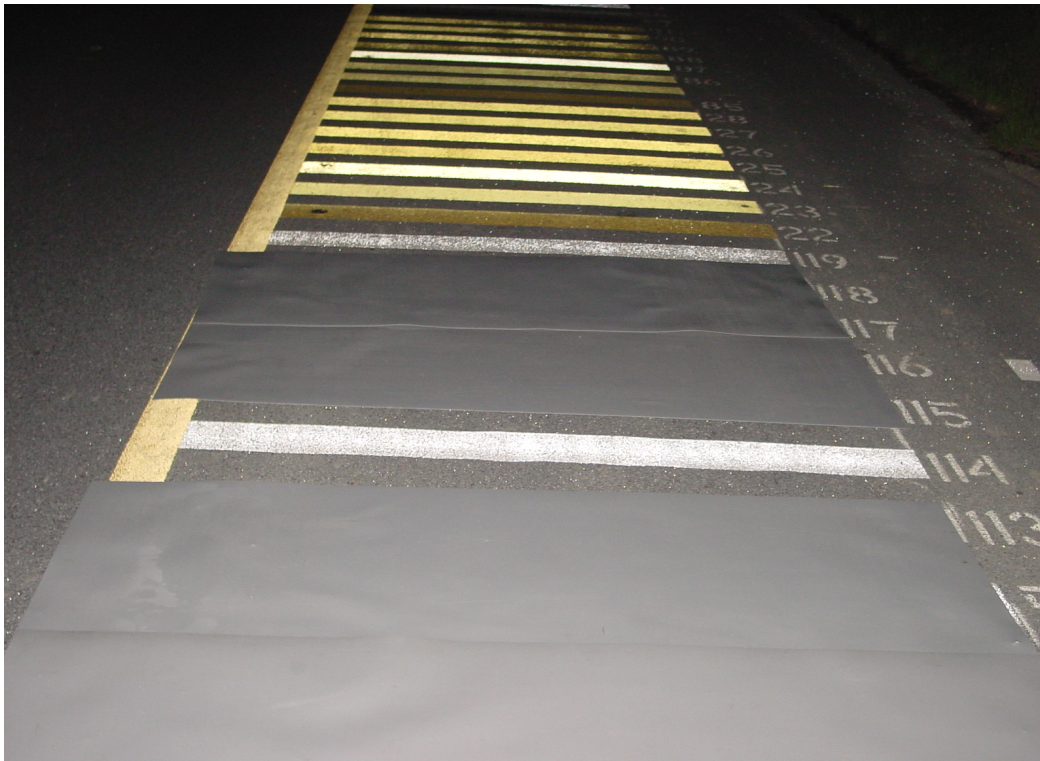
PAVEMENT MARKING EVALUATION LAYOUT
